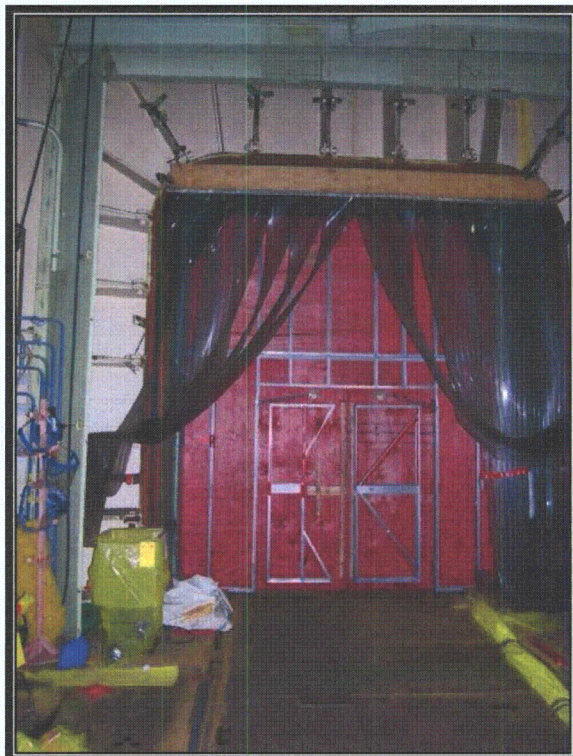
Opening from reactor building to trestleway (Photograph by RCG&A, 2008)
